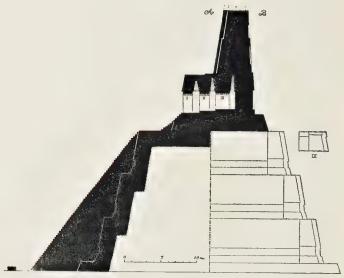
Tikal: Section of Temple II. I. Five crossbeams of zapotl wood have been taken from the places. II. Five crossbeams of zapotl wood with figures in low relief, one is entire, one half-beam still in temple and three are missing. III. Six crossbeams of zapotl wood.
